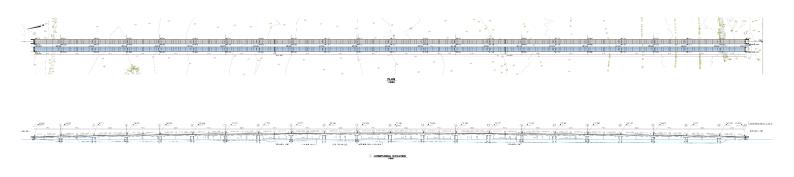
Bridge Plan and Elevation. Click on the image to open it in a higher resolution
